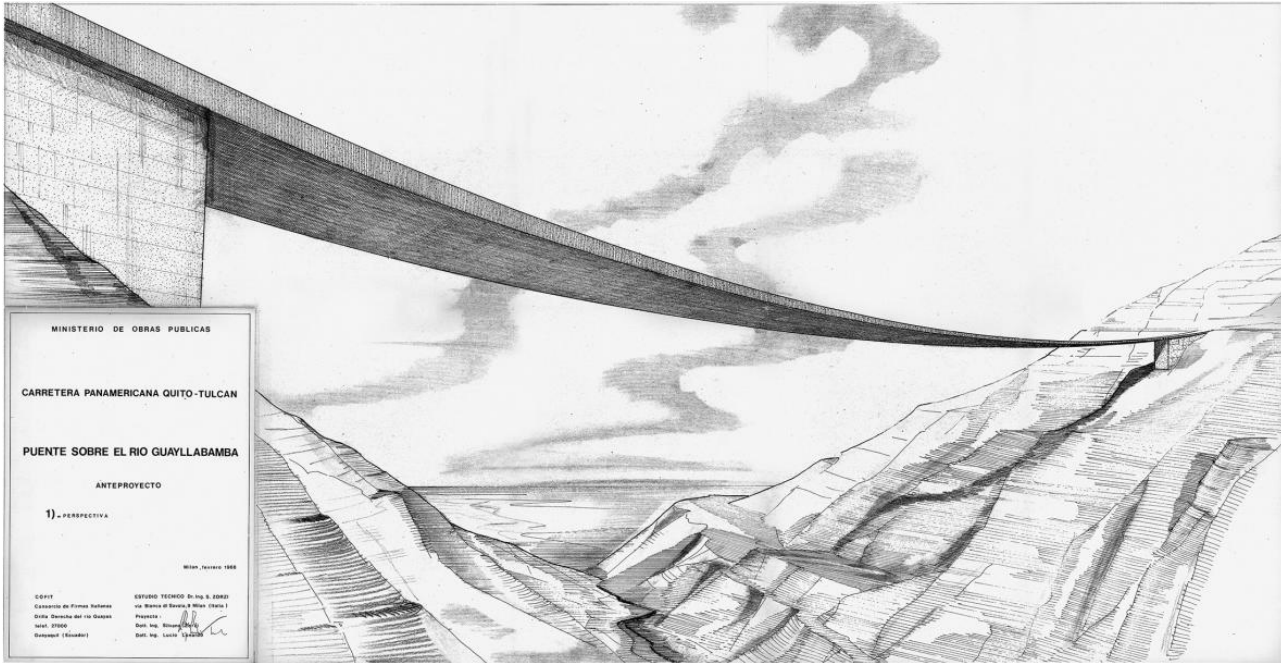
Bridge over the river Guayllabamba, competition project. Perspective view (Historical Archive of the Politecnico di Milano, Silvano Zorzi Collection, Milan).
